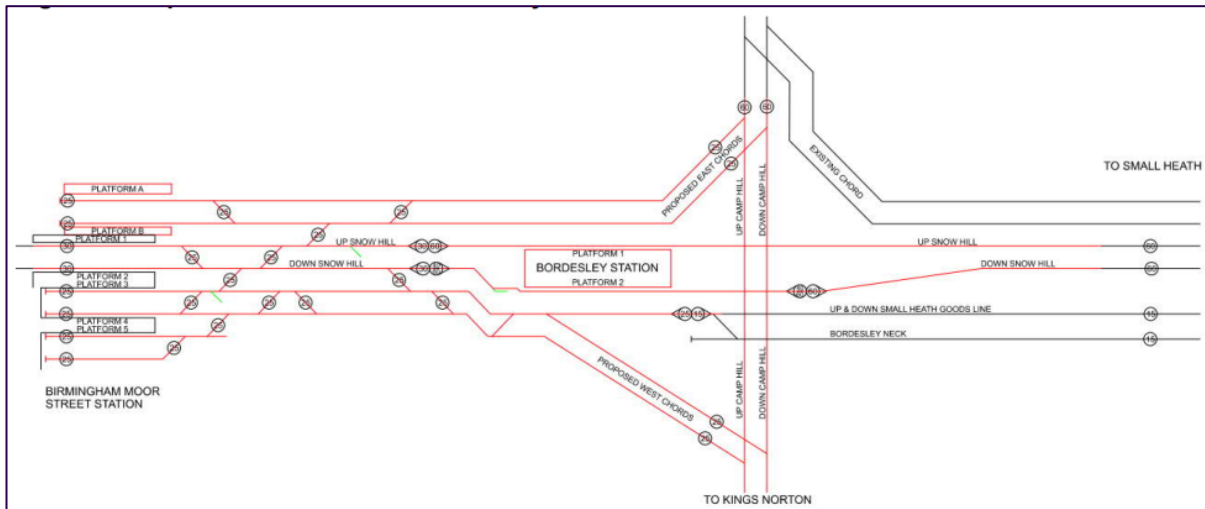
Bordesley Station Retention Option 1 Track Layout showing that the station and the West Bordesley Chord would encroach on the Smith's Gardens residential development which is under construction and require major remodelling of Bedford Road.
